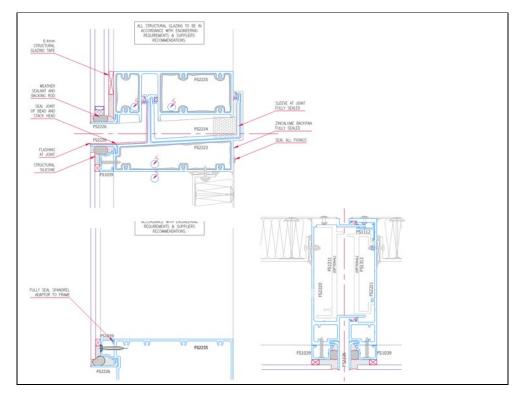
HEAD, SILL and JAMB sections from manufacturer's drawings.
